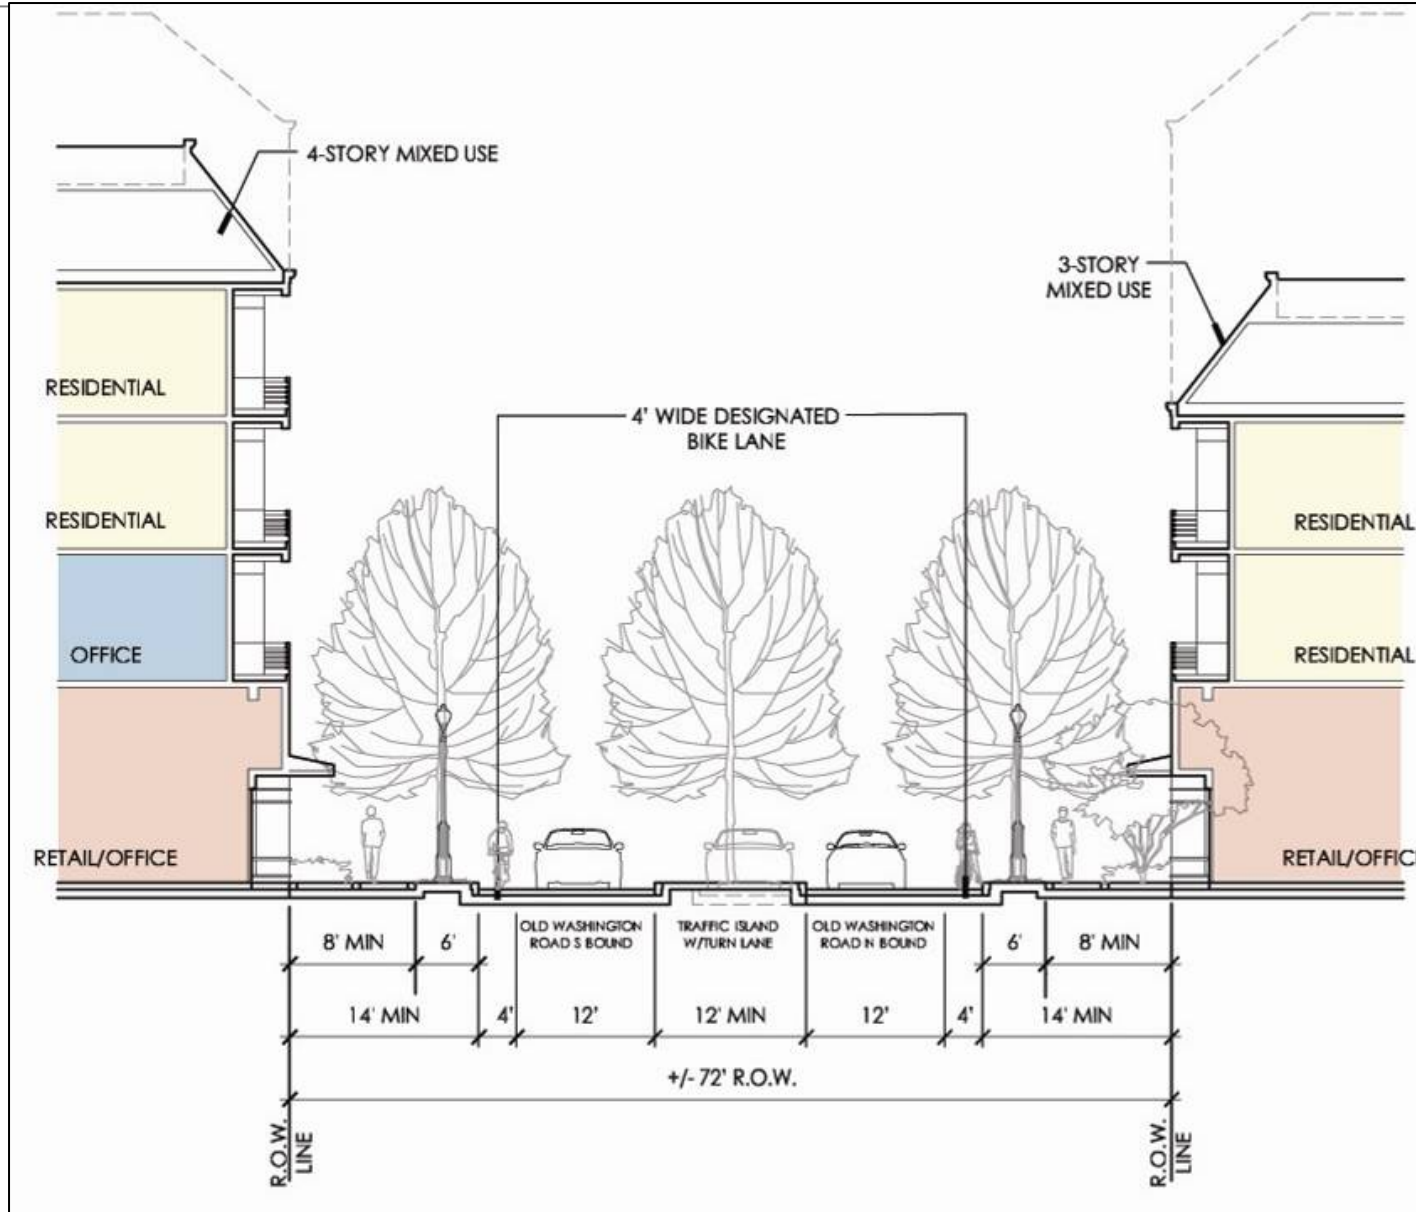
Waldorf Urban Major Collector Type B: Old Washington Road
